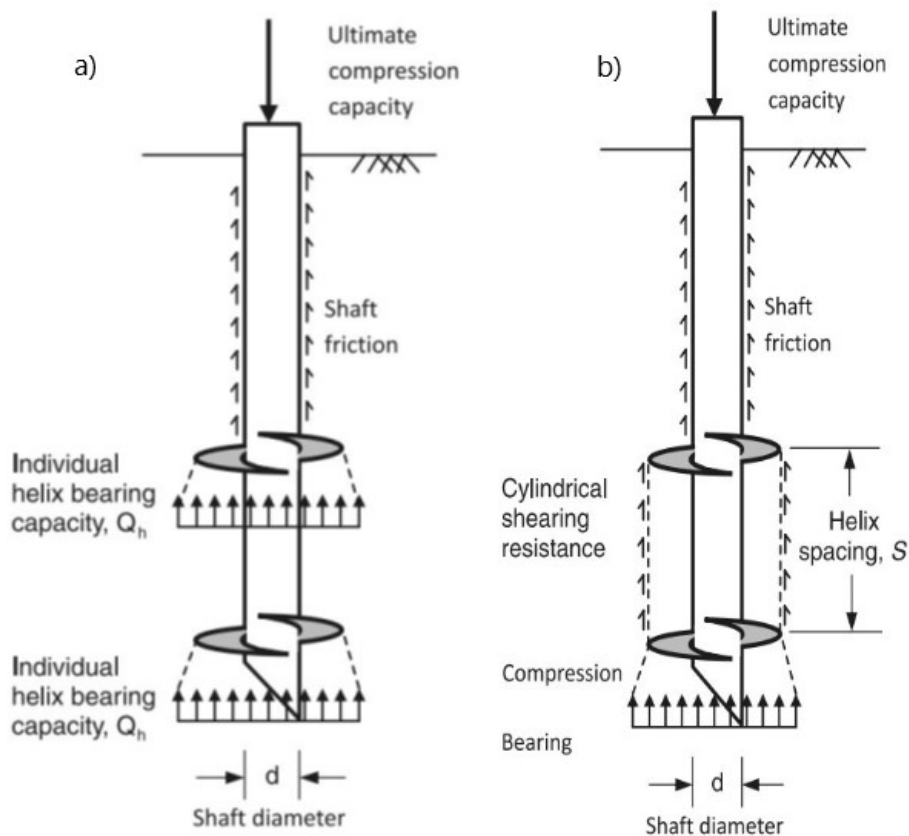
a) The individual bearing method. b) Cylindrical shearing method for helical piles [Nasr, M.H., 2004]
